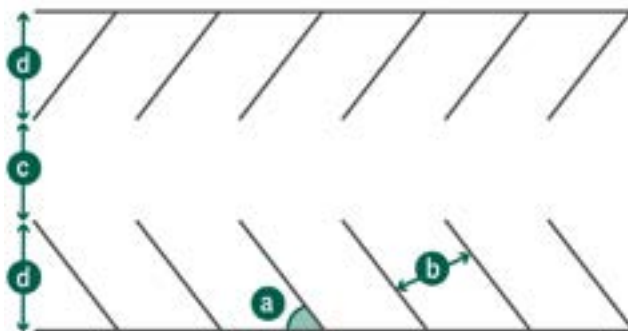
MINIMUM PARKING STALL DIMENSIONS
